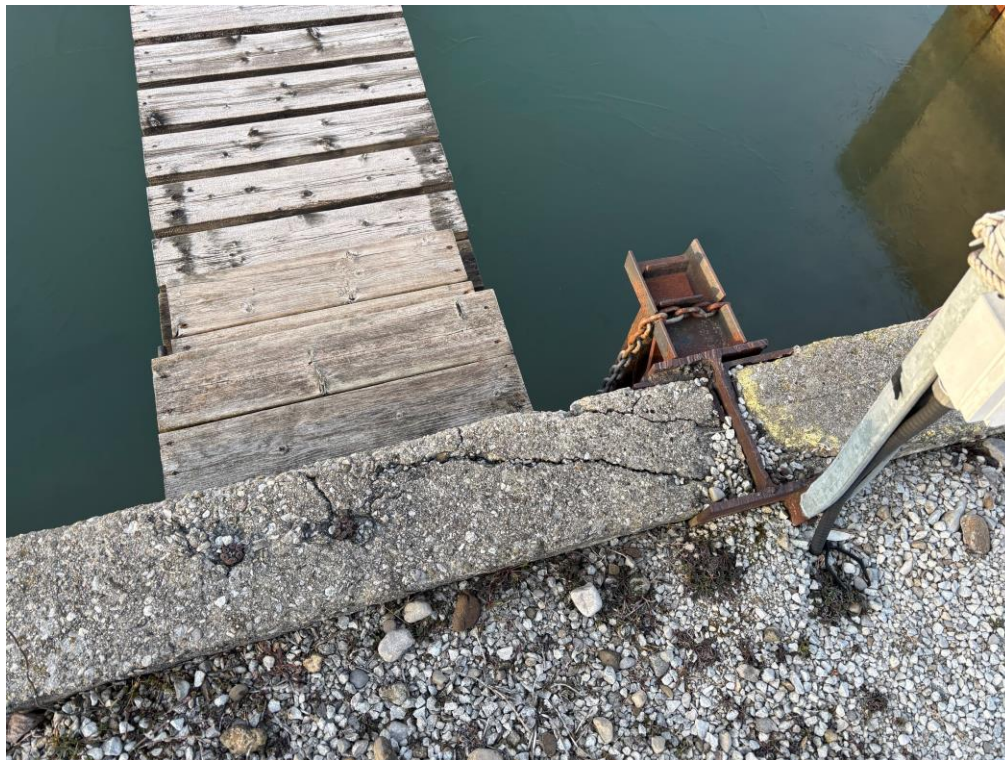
Cracking of Concrete Panel at S7 (10/04/2025)
